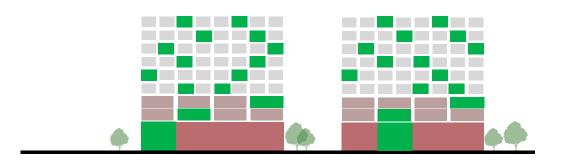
25% of the Site area for landscaping via green walls and roofs.
